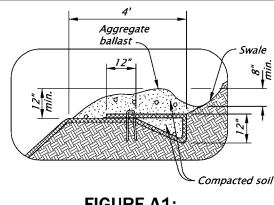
TOP OF BANK ANCHOR TRENCH, H>3' AND TERMINAL SLOPE NOT TO SCALE
